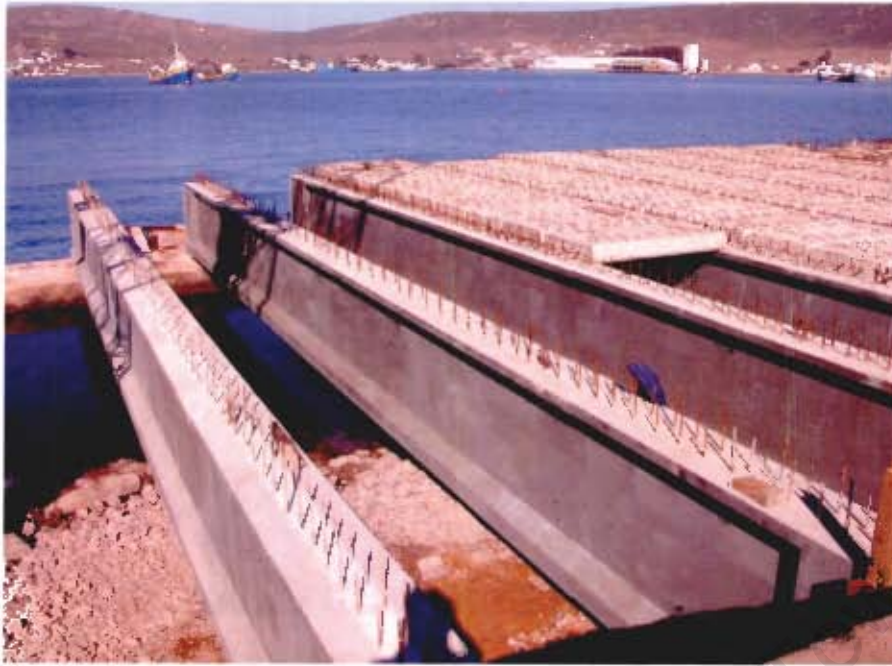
New transverse beams for Quay 3, St Helena Bay
